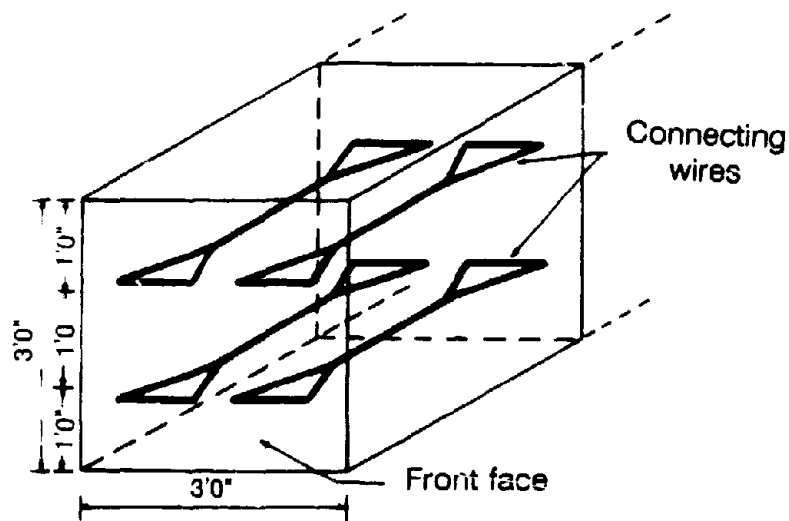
Connecting wires between lifts.⁽¹⁾
